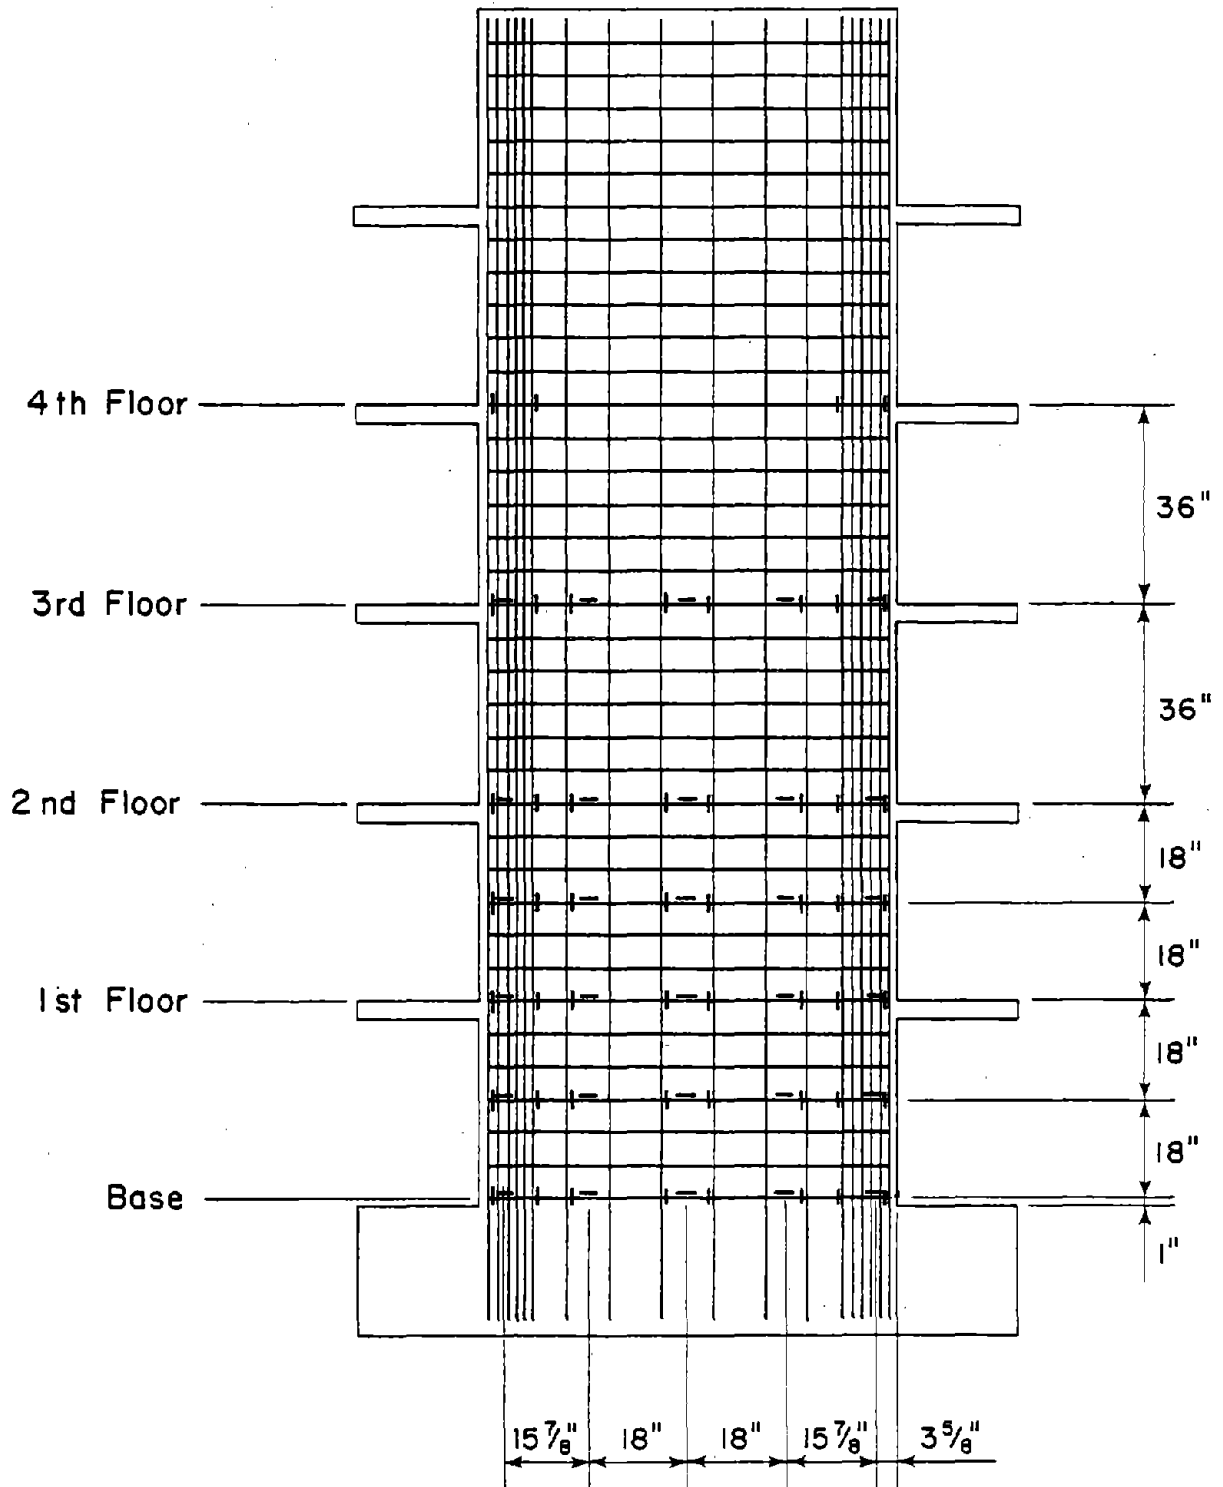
Strain Gage Locations on Vertical and Horizontal Reinforcement for Specimen CI-1
